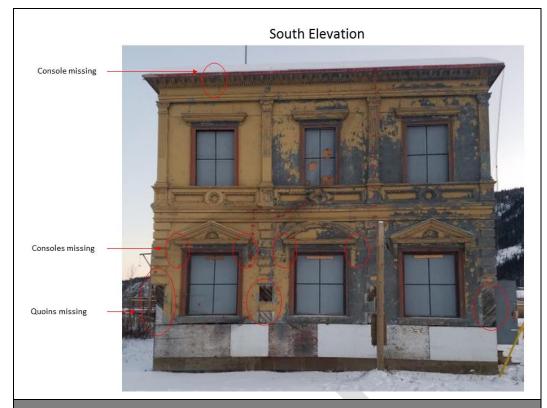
South elevation with damaged/missing cladding locations identified.
